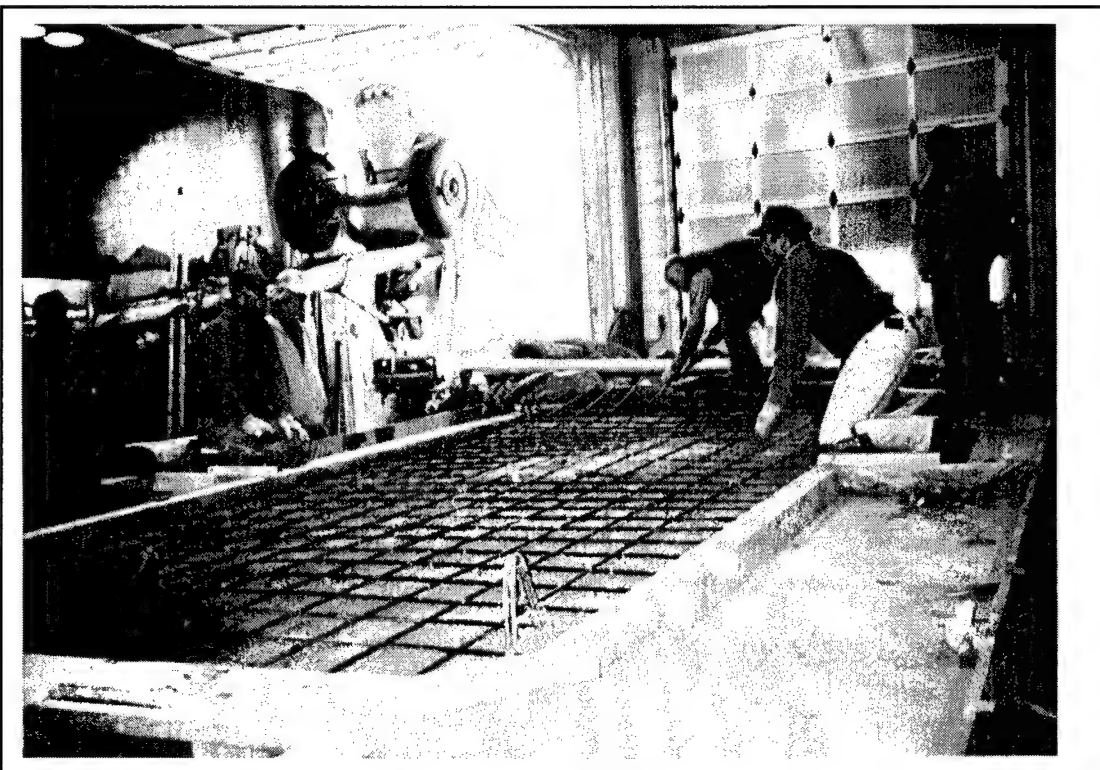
Top layer of distribution reinforcement (CFRP cable) being placed after 15 inches of concreting.
